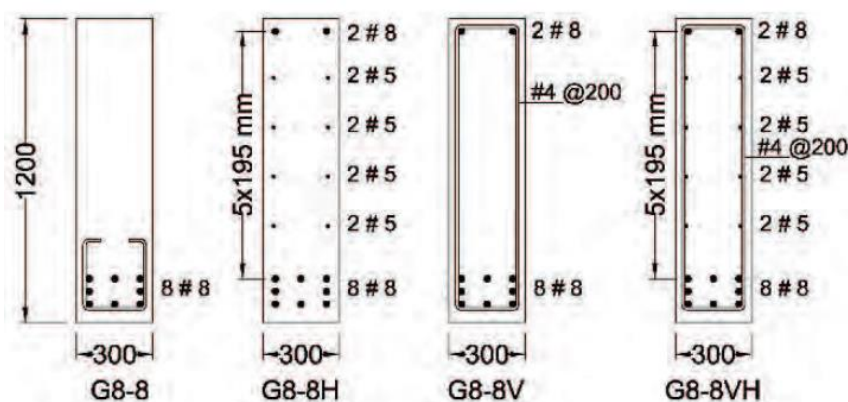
Detailing Pattern for GFRP Reinforced Specimens (Ibrahim, Wakjira and Ebead, 2020)
